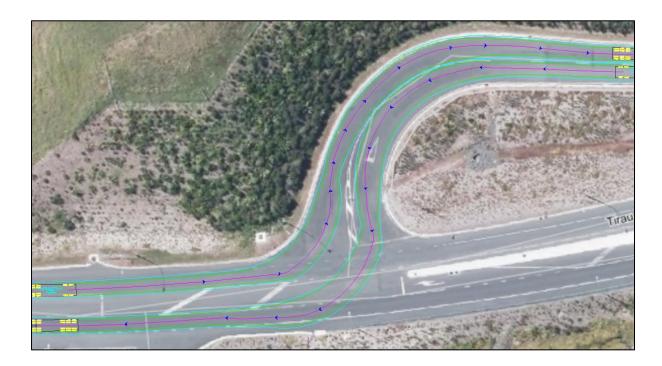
Trucks Turning at Newcombe Road Towards Cambridge
